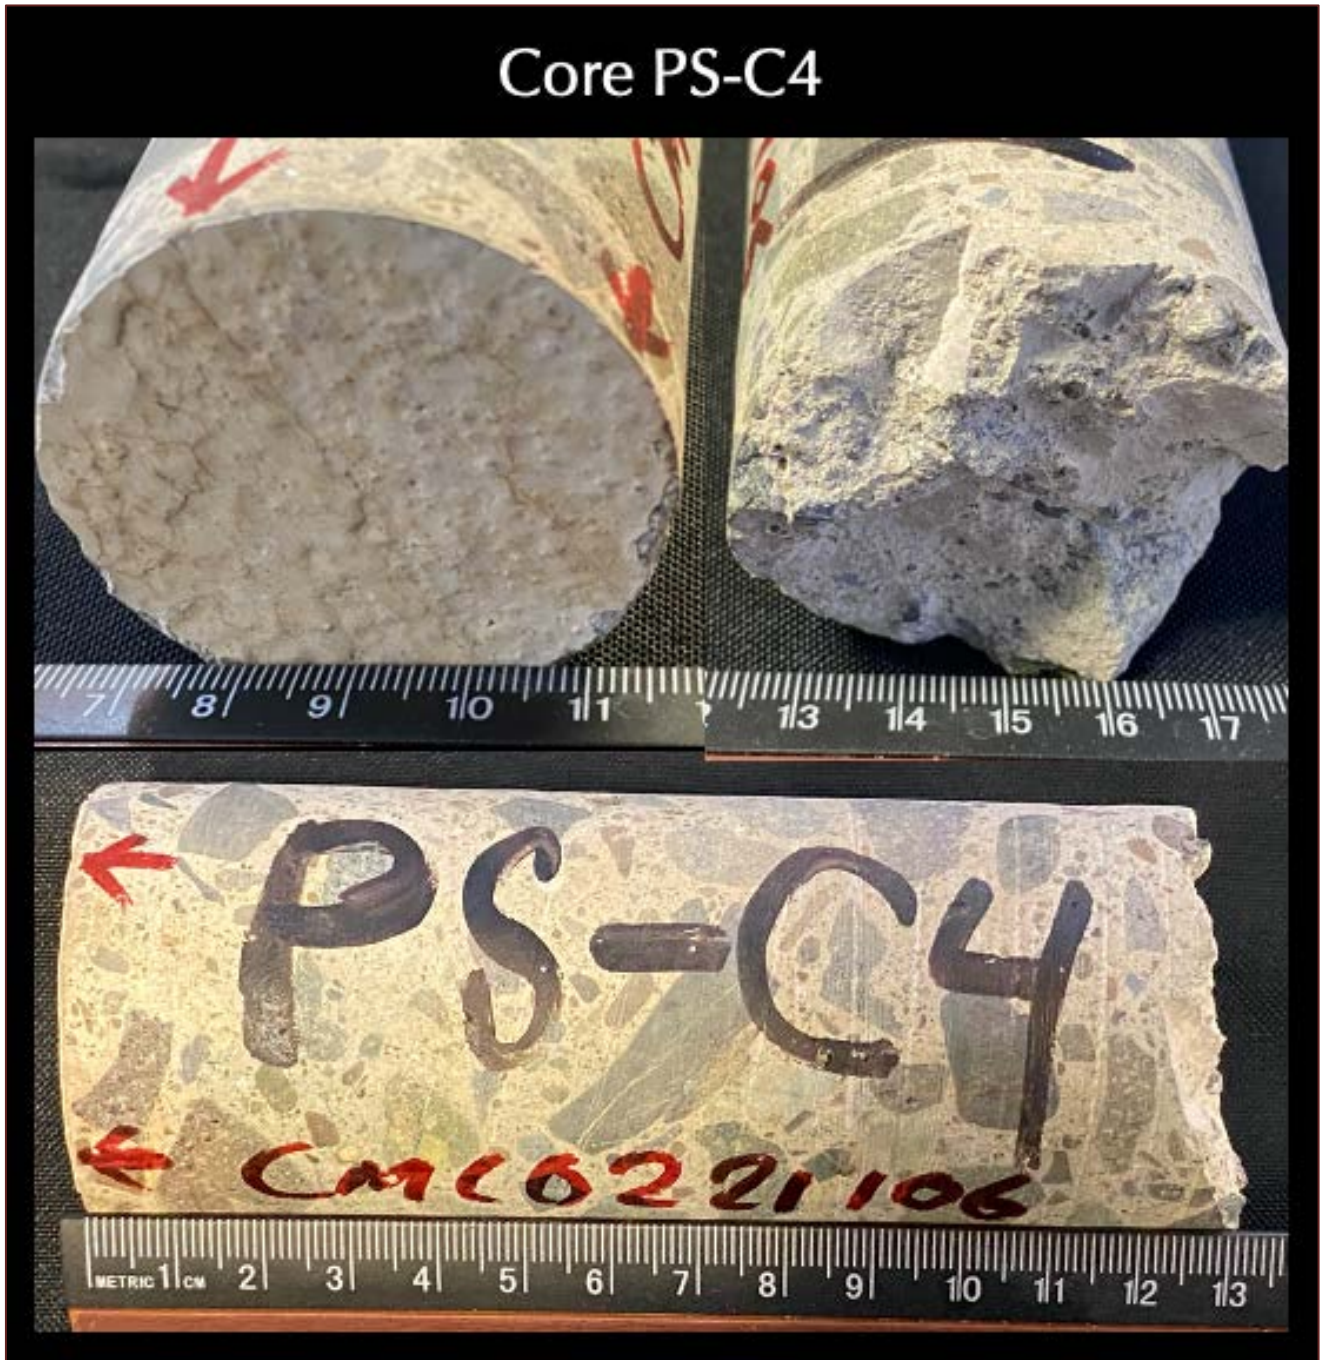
Shown are the exterior painted surface (top left), interior fractured end (top right) and side cylindrical surfaces of the Core PS-C4 from Pump Station.
